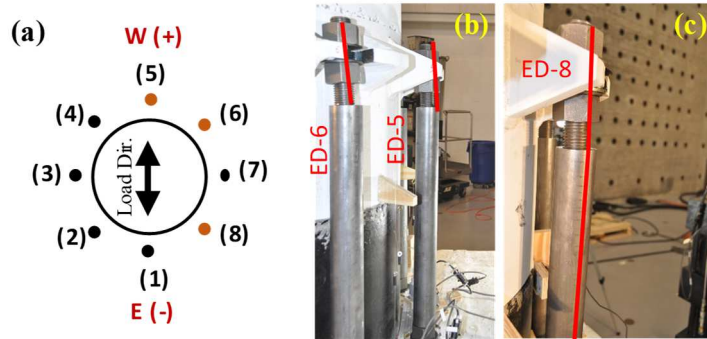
Slight local buckling at top connection of ED links in PUED rocking column at $1.2 \times DE$: (a) location of damaged ED links (brown circles); (b) ED-5 and ED-6; (c) ED-8.
